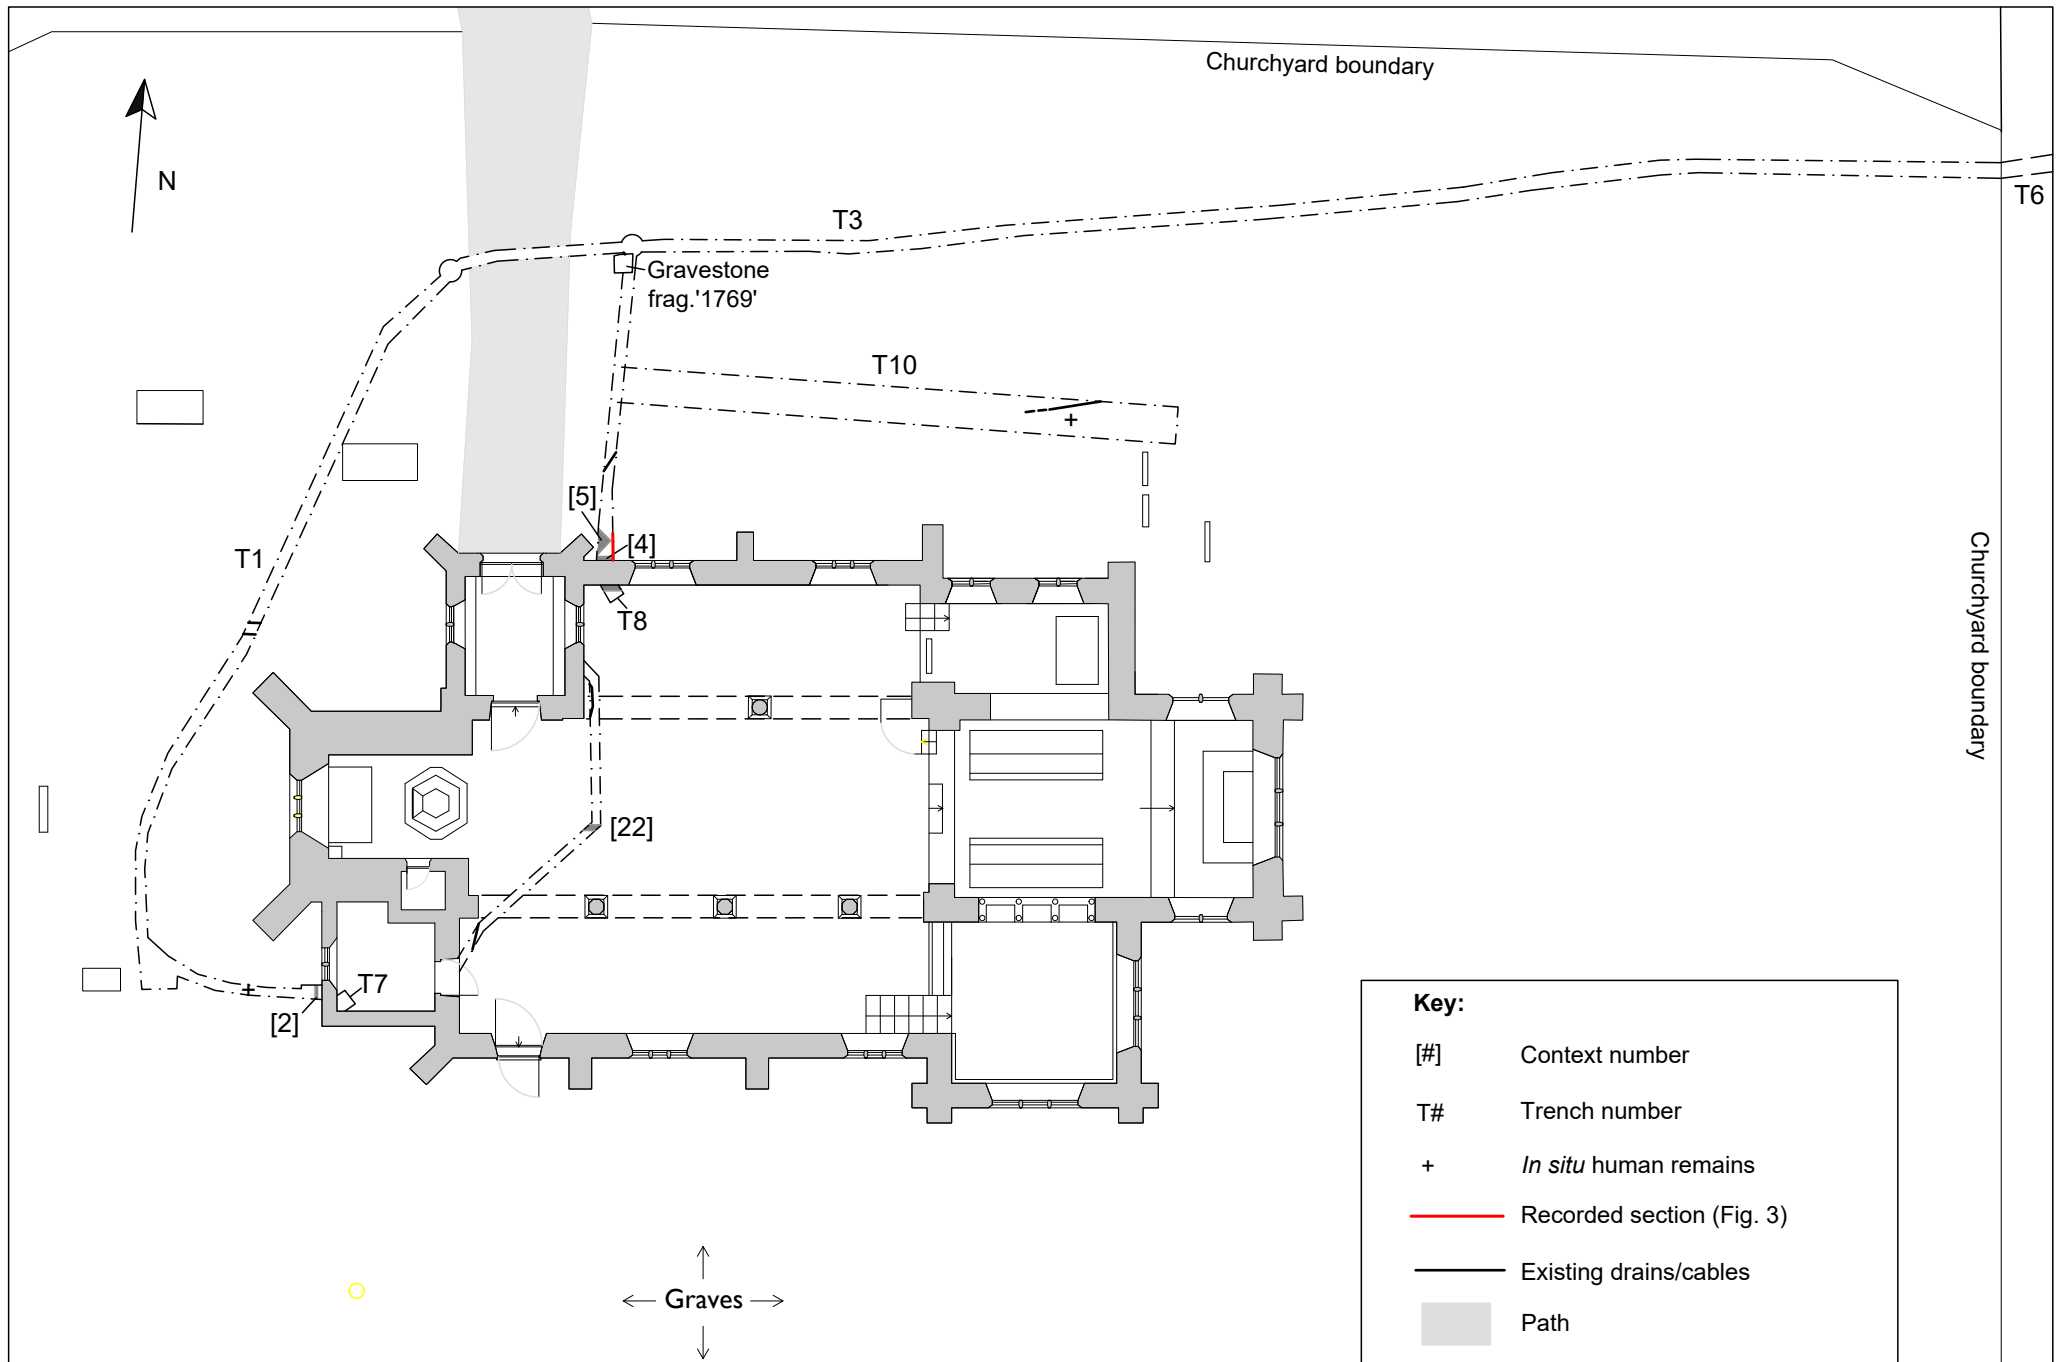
ENF 145651; St Andrew's Church with excavated trenches and results of work. Scale 1:200
